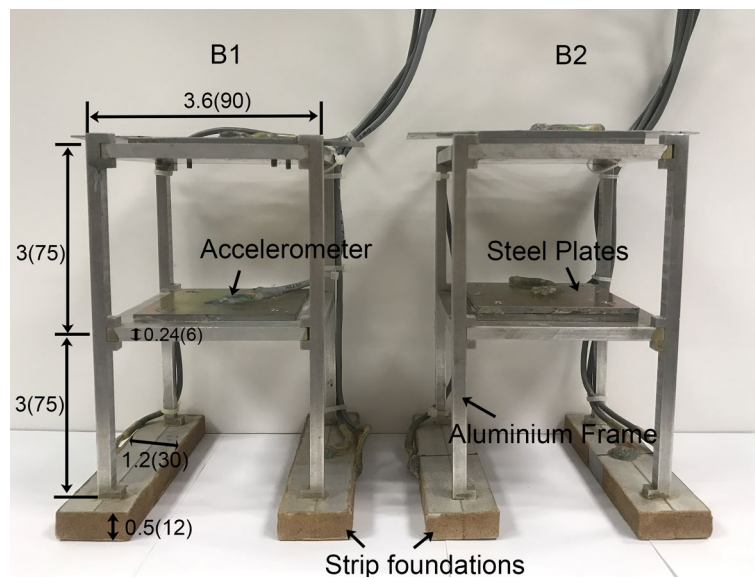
Photo of model structures – Left: B1 ‘light’ structure; Right: B2 ‘heavy’ structure. Dimensions at prototype scale in m (model scale in mm).
